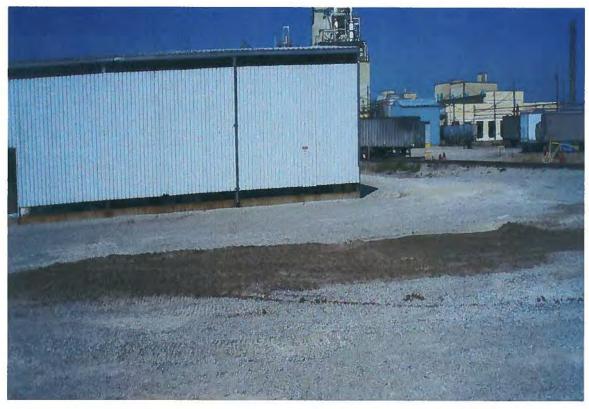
Backfill of S0609 (borings B-18/B-28/B-36/B-44)
